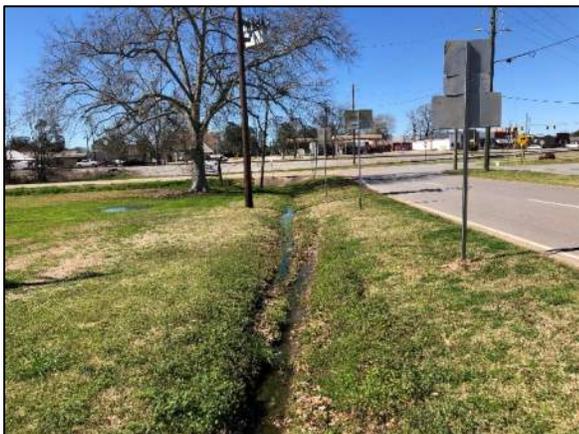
PS 1, looking towards its origin at 18" RCP. Photo taken 2/23/2021.
